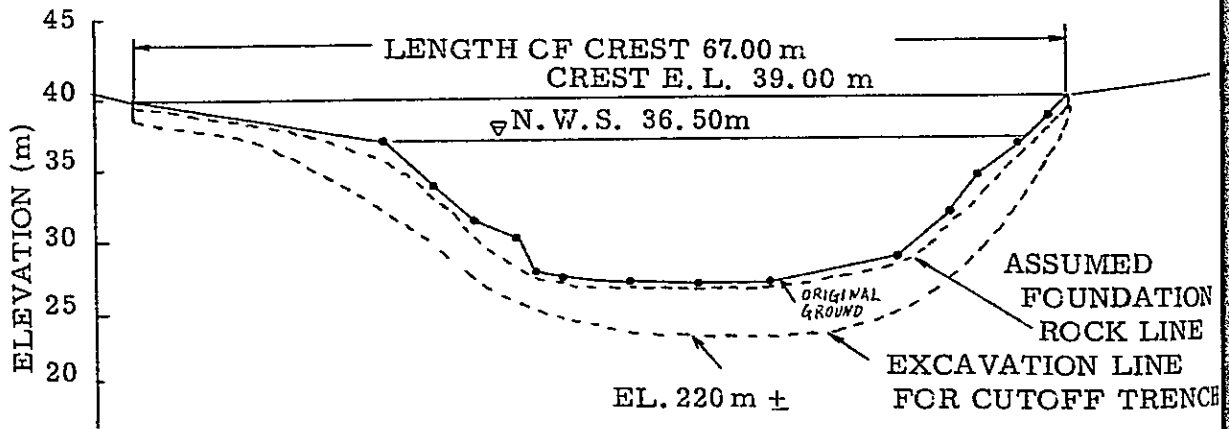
CROSS SECTION OF DJEPARA DAM
